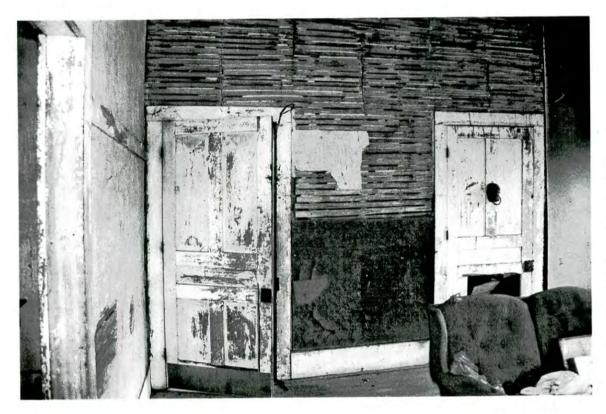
Calvin C. Gore House looking east in hall toward doors to rear bedroom and hall and, at far left, partition wall between hall and parlor
